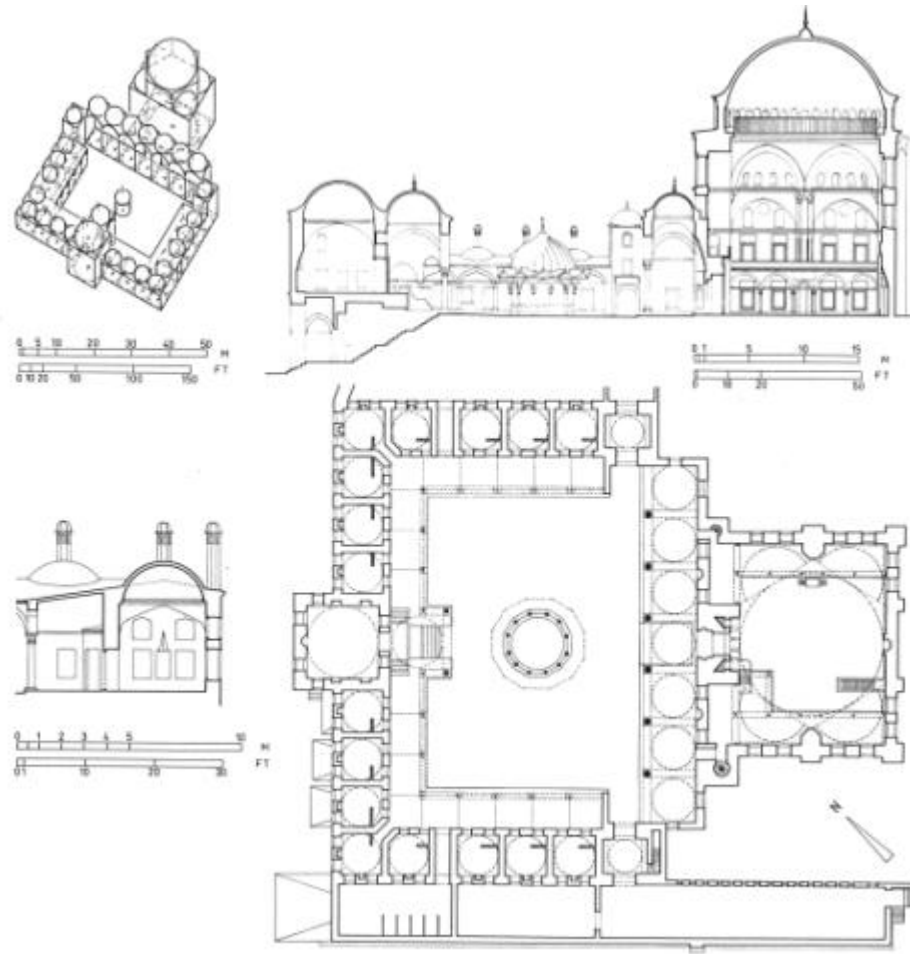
Isometric projection, longitudinal section and plan (Encyclopedia ofWorld Architecture)
